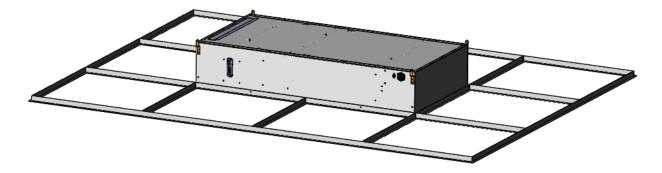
Turn the PK-220 so the Grilles Face Down and the PK-220 Nests into Ceiling Grid
